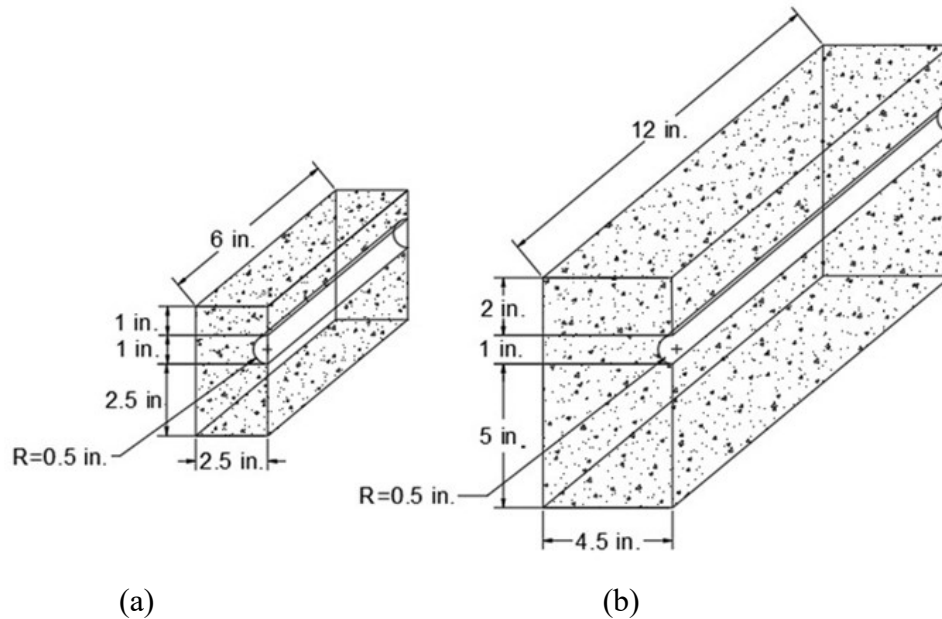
Beam-end specimen, (a) Portion of the specimen with 1 in. concrete cover and 6 in. bonded length, (b) Portion of the specimen with 2 in. concrete cover and 12 in. bonded length (figure after Tholen and Darwin 1996)
